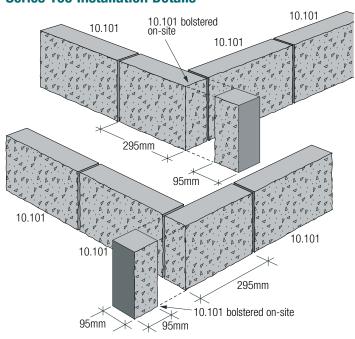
Corner Bonding Detail Using Bolstered-On-Site Split Face Block
